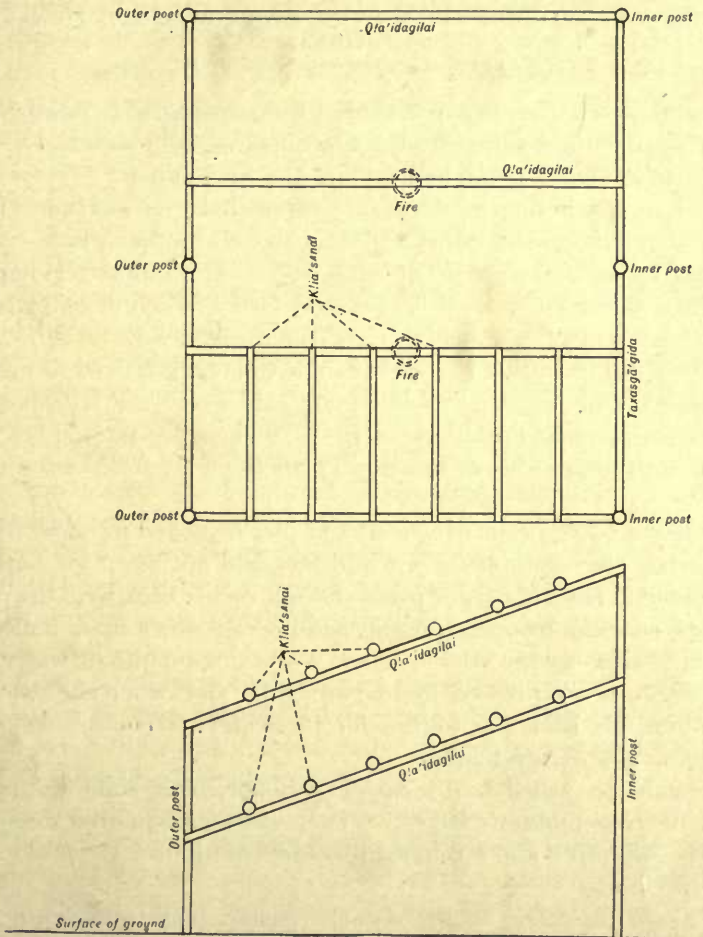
Drying frame for fish, horizontal and vertical plans.
